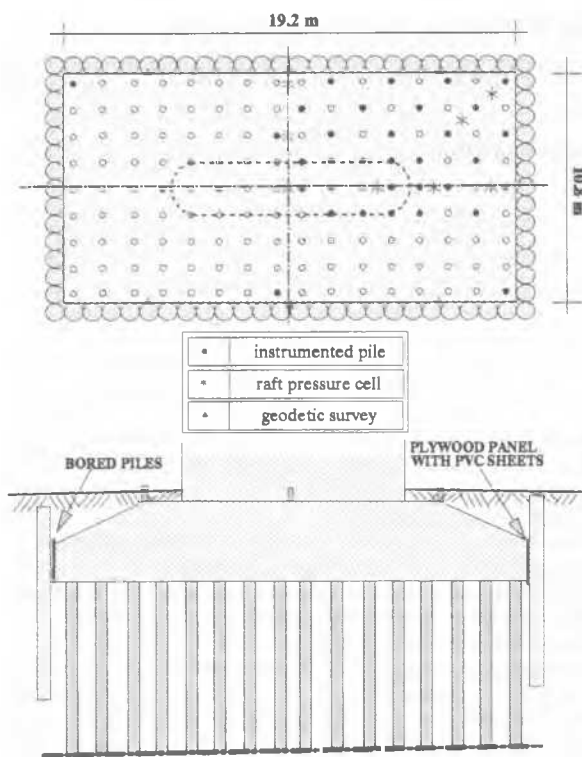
Plan view and longitudinal section of the foundation of pier n. 7 of the bridge over the Garigliano, showing the location of installed instrumentation
